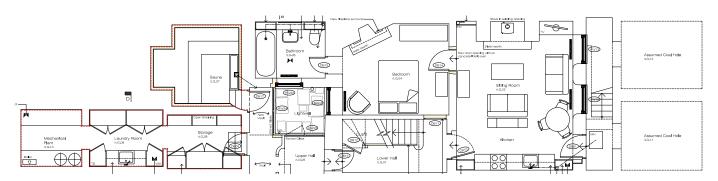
PROPOSED LOWER GROUND FLOOR
